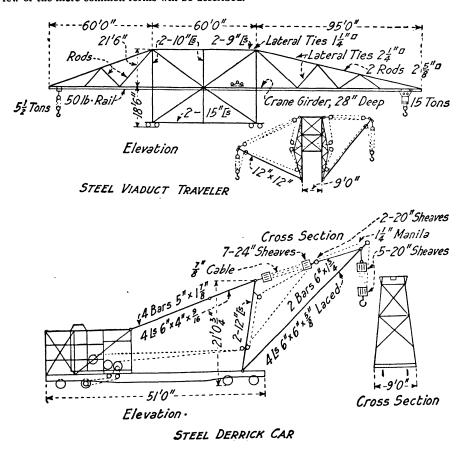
DETAILS OF A VIADUCT TRAVELER AND A STEEL DERRICK CAR.
